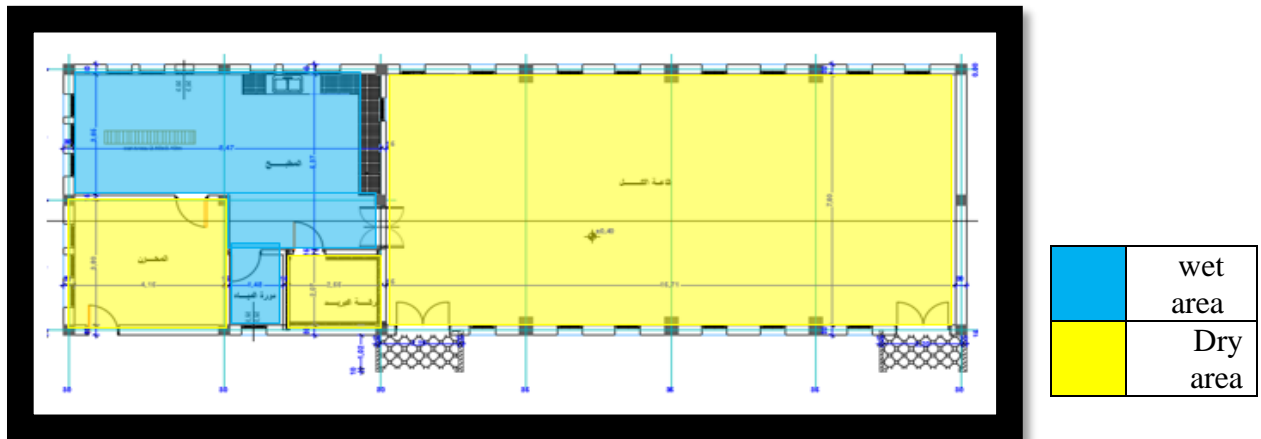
feild features of canteen ,Source: canteen plan adapted by the author 2025
